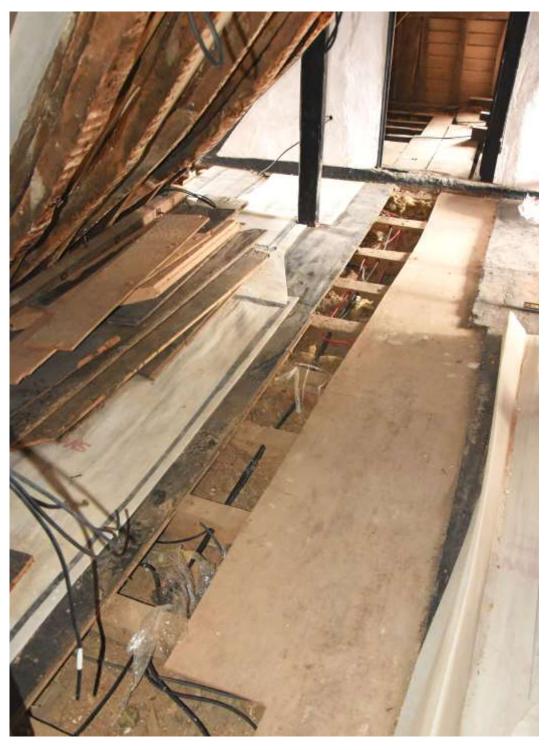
Floor joists within Room S-04, looking northwest. Although not extensively exposed the joists were all fairly regular in width, c 100mm to 110mm
